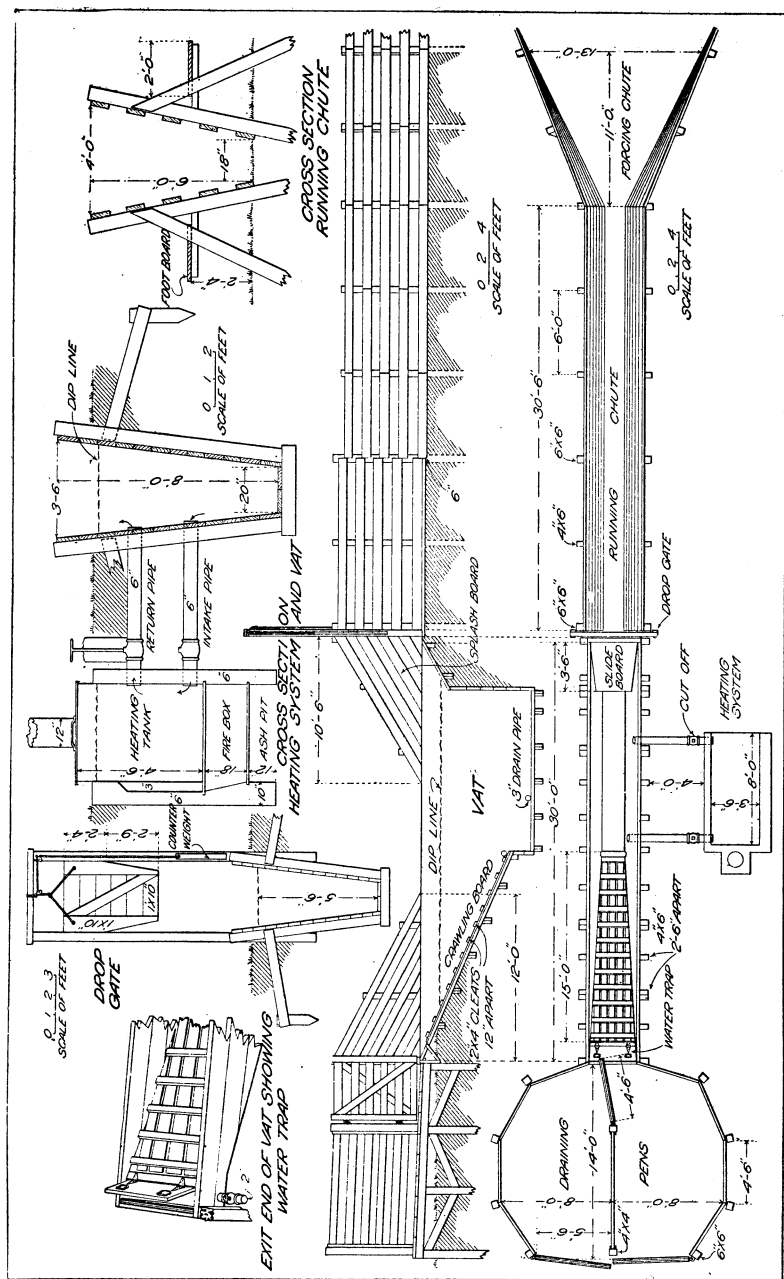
Plan of cattle-dipping plant with wooden vat.
